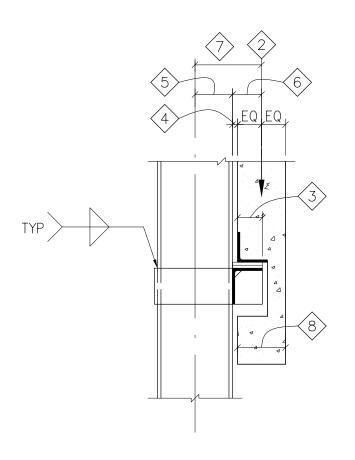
PRECAST CONCRETE ENGINEERING ISSUES - CASE A
